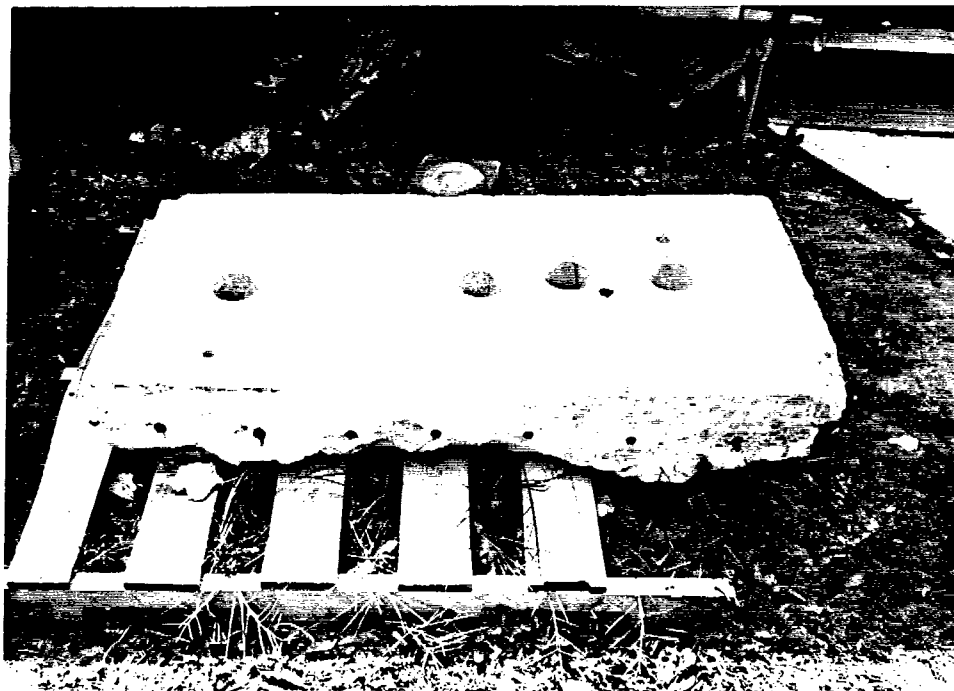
Test Section of Concrete Slab at NCDOT Materials & Tests Unit
